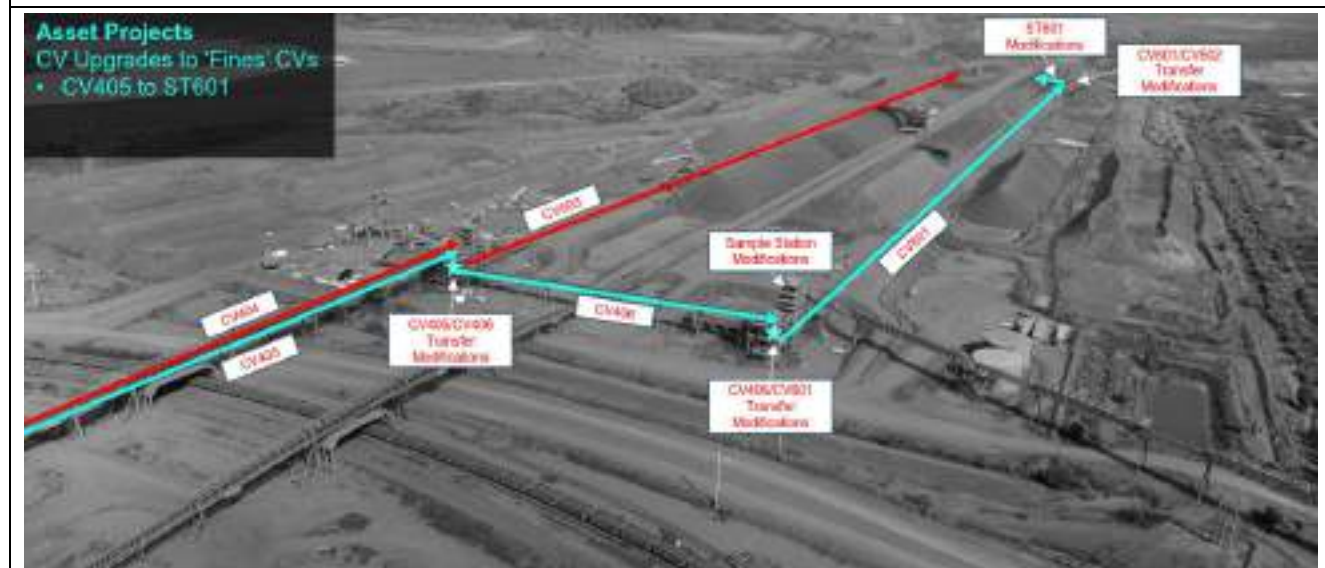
Ore Handling Plant 4 Fines Conveyor Upgrades
